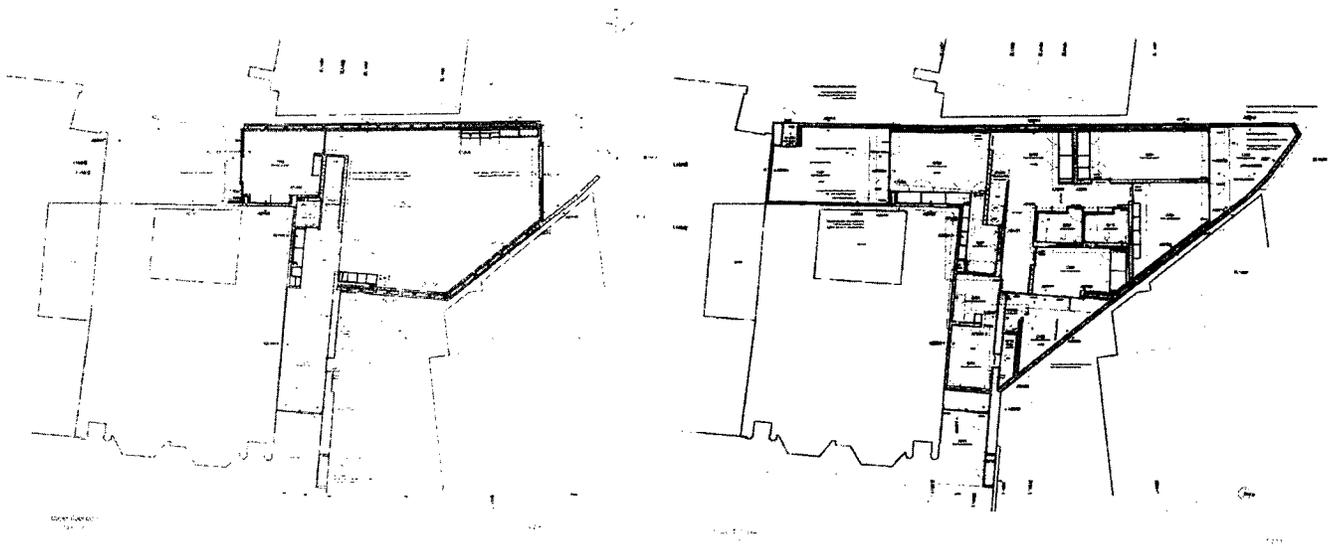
Upper and lower ground floor plans. Caruso St John. (source: *As Built: Caruso St John Architects*)
